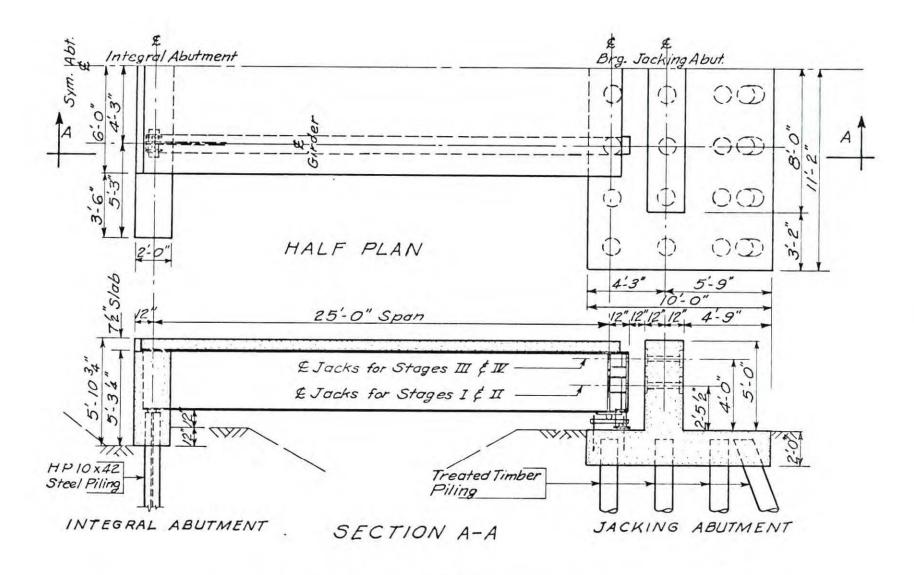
Schematic of model bridge and abutment located at Brookings Area DOT office (Sarsam 1972).
